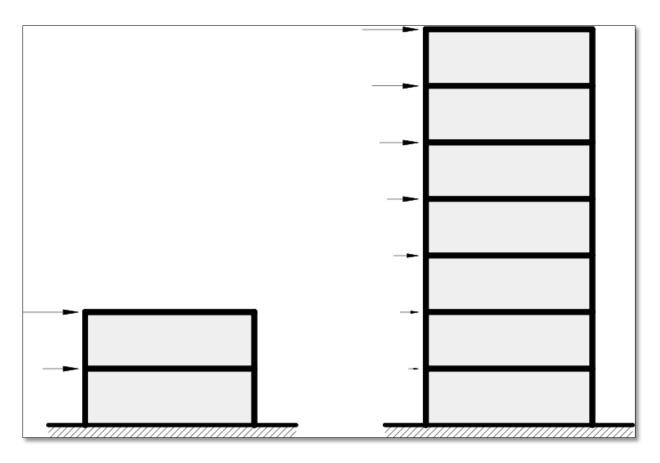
(a) Squat shear wall (b) Cantilever shear wall
